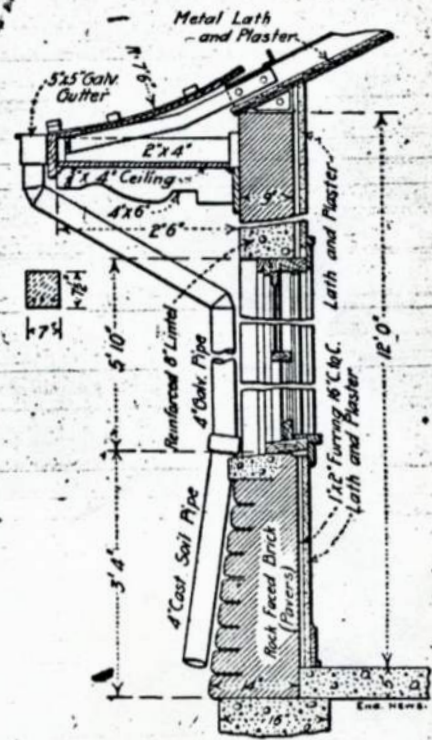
Section of Wall of Brick Station, Illinois Traction System
